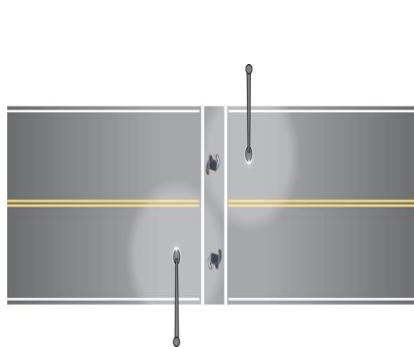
New FHWA design recommendations for lighting layout for crosswalks, Source: FHWA Report on Lighting Design for Crosswalks, April 2008.
